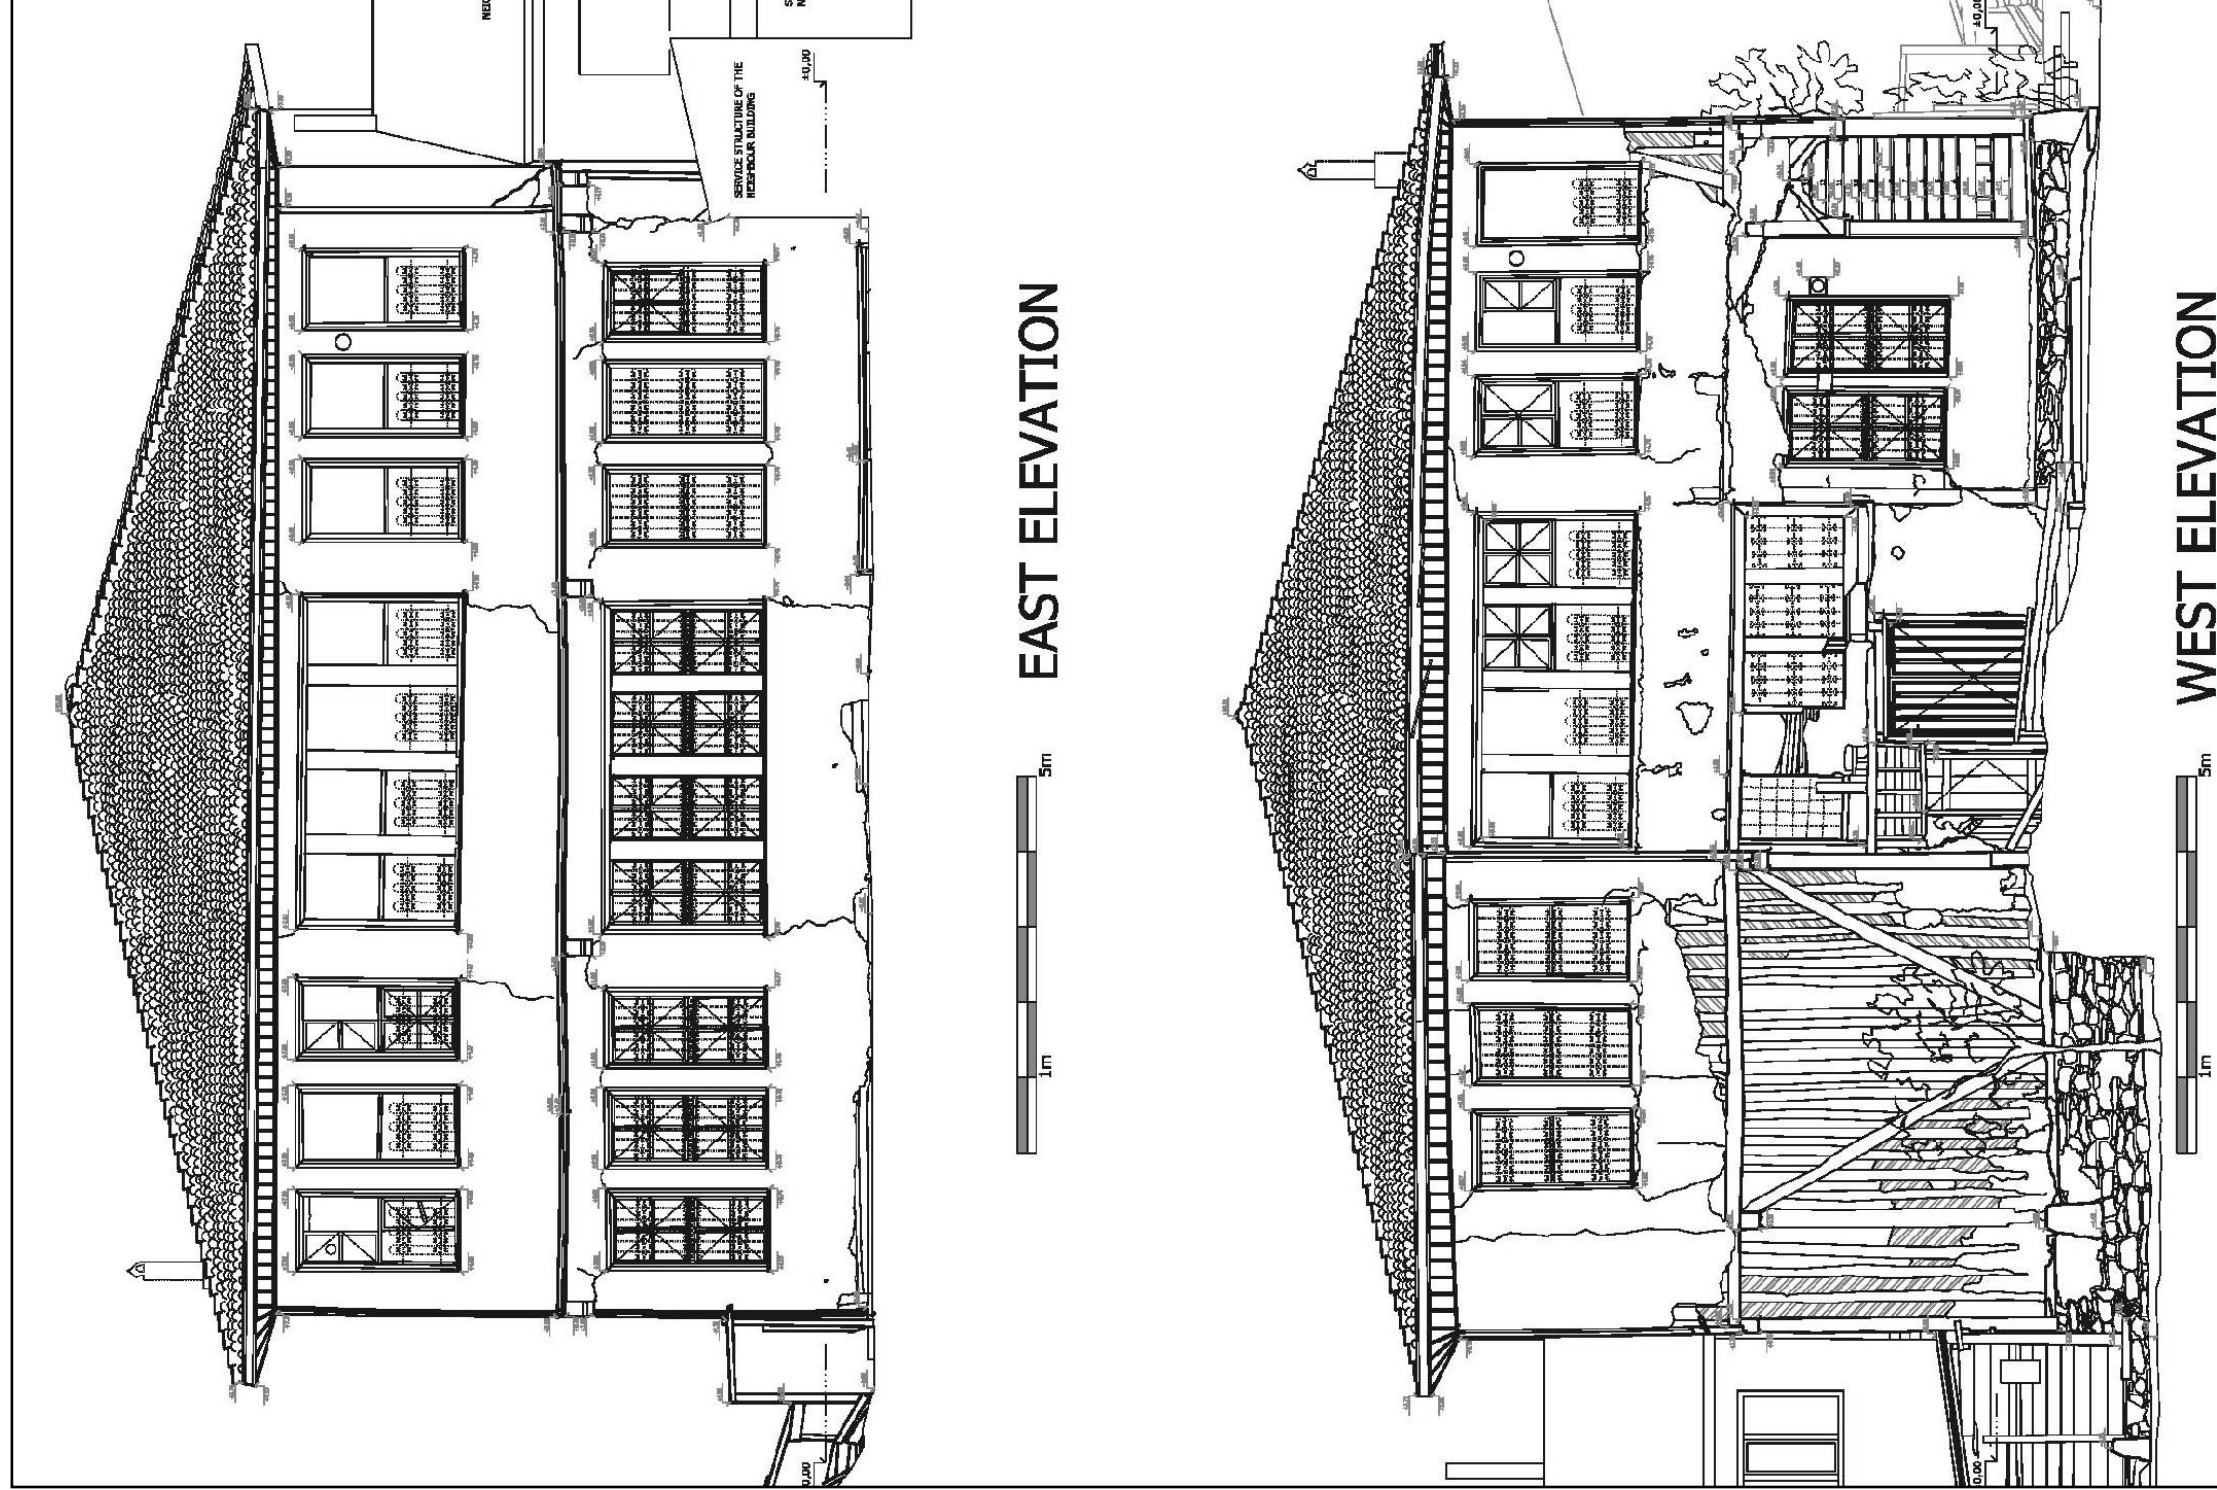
East and West Façades: 1/100 (presented in 1/50 at Jury)
